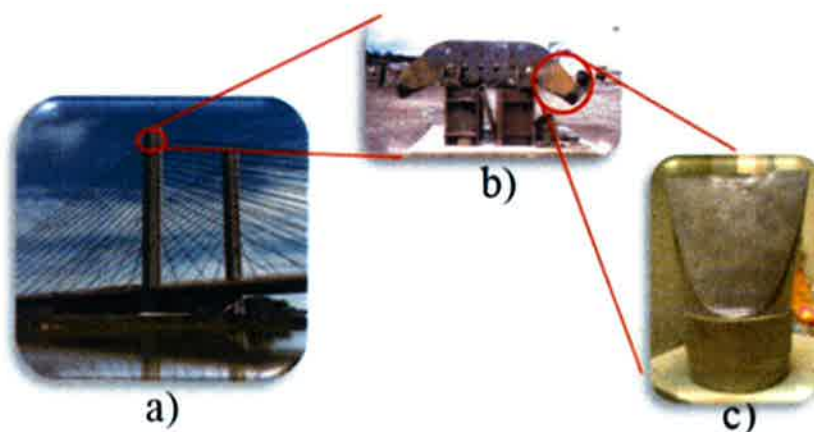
a) Cable-Stayed bridge on Papaloapan River, México; b) Set of anchorages welded with the tapered plate; c) Anchorage put out of service.
